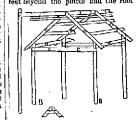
FIG. H-CONSTRUCTION OF A RACK. half pitch. The boards are
